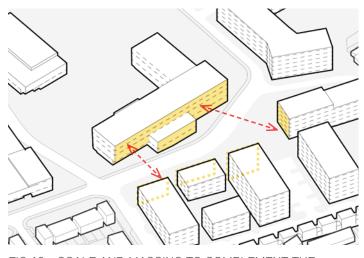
SCALE AND MASSING TO COMPLEMENT THE SCHOOL BUILDINGS
